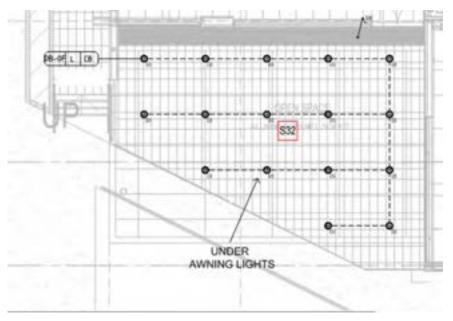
Warehouse 1 Employee Outdoor Meal Break Area Lighting Plan
